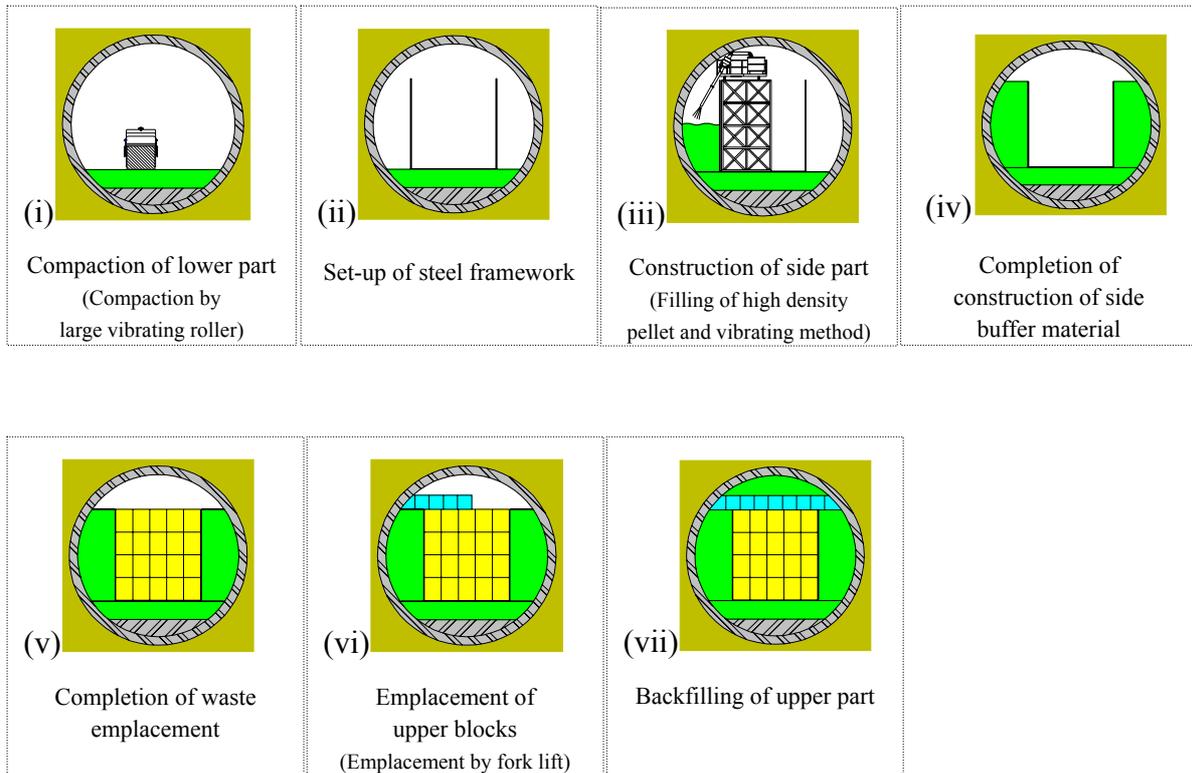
Construction of buffer material in the circular disposal tunnel
